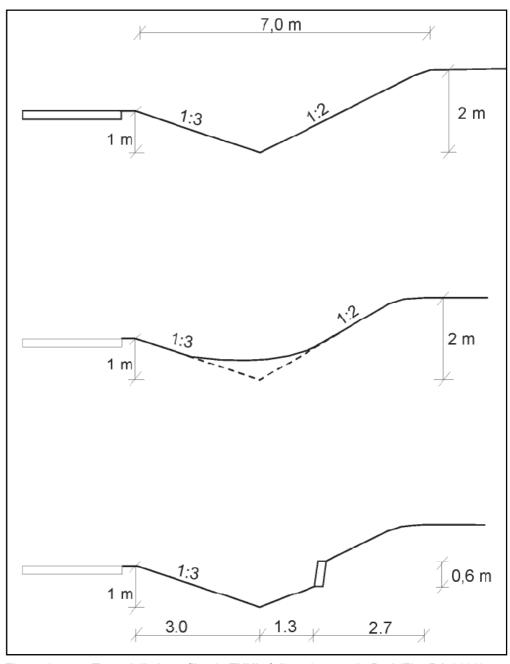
Tested ditch profiles in TKK's full-scale tests in Pori (FinnRA 2003).
